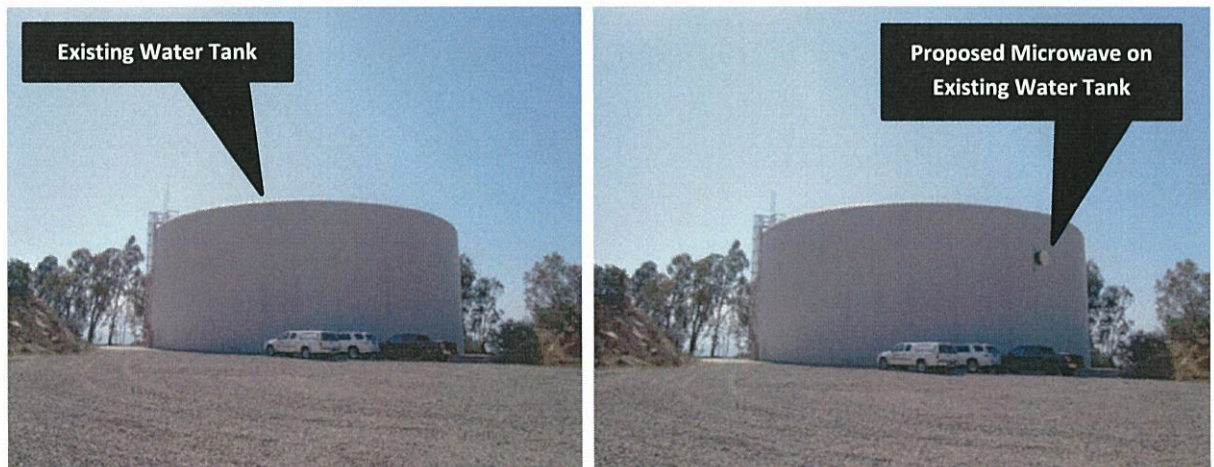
View of existing site (left) and proposed facility (right) looking southeast on the site.
